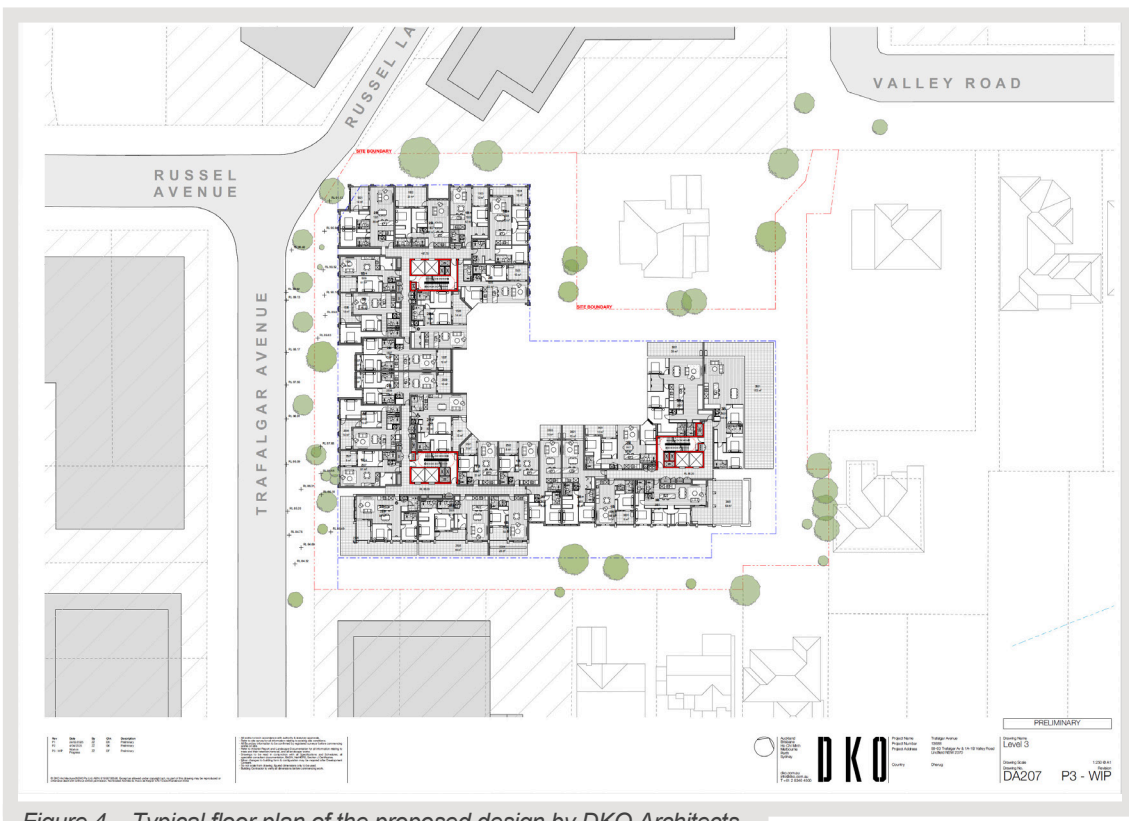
Typical floor plan of the proposed design by DKO Architects.
